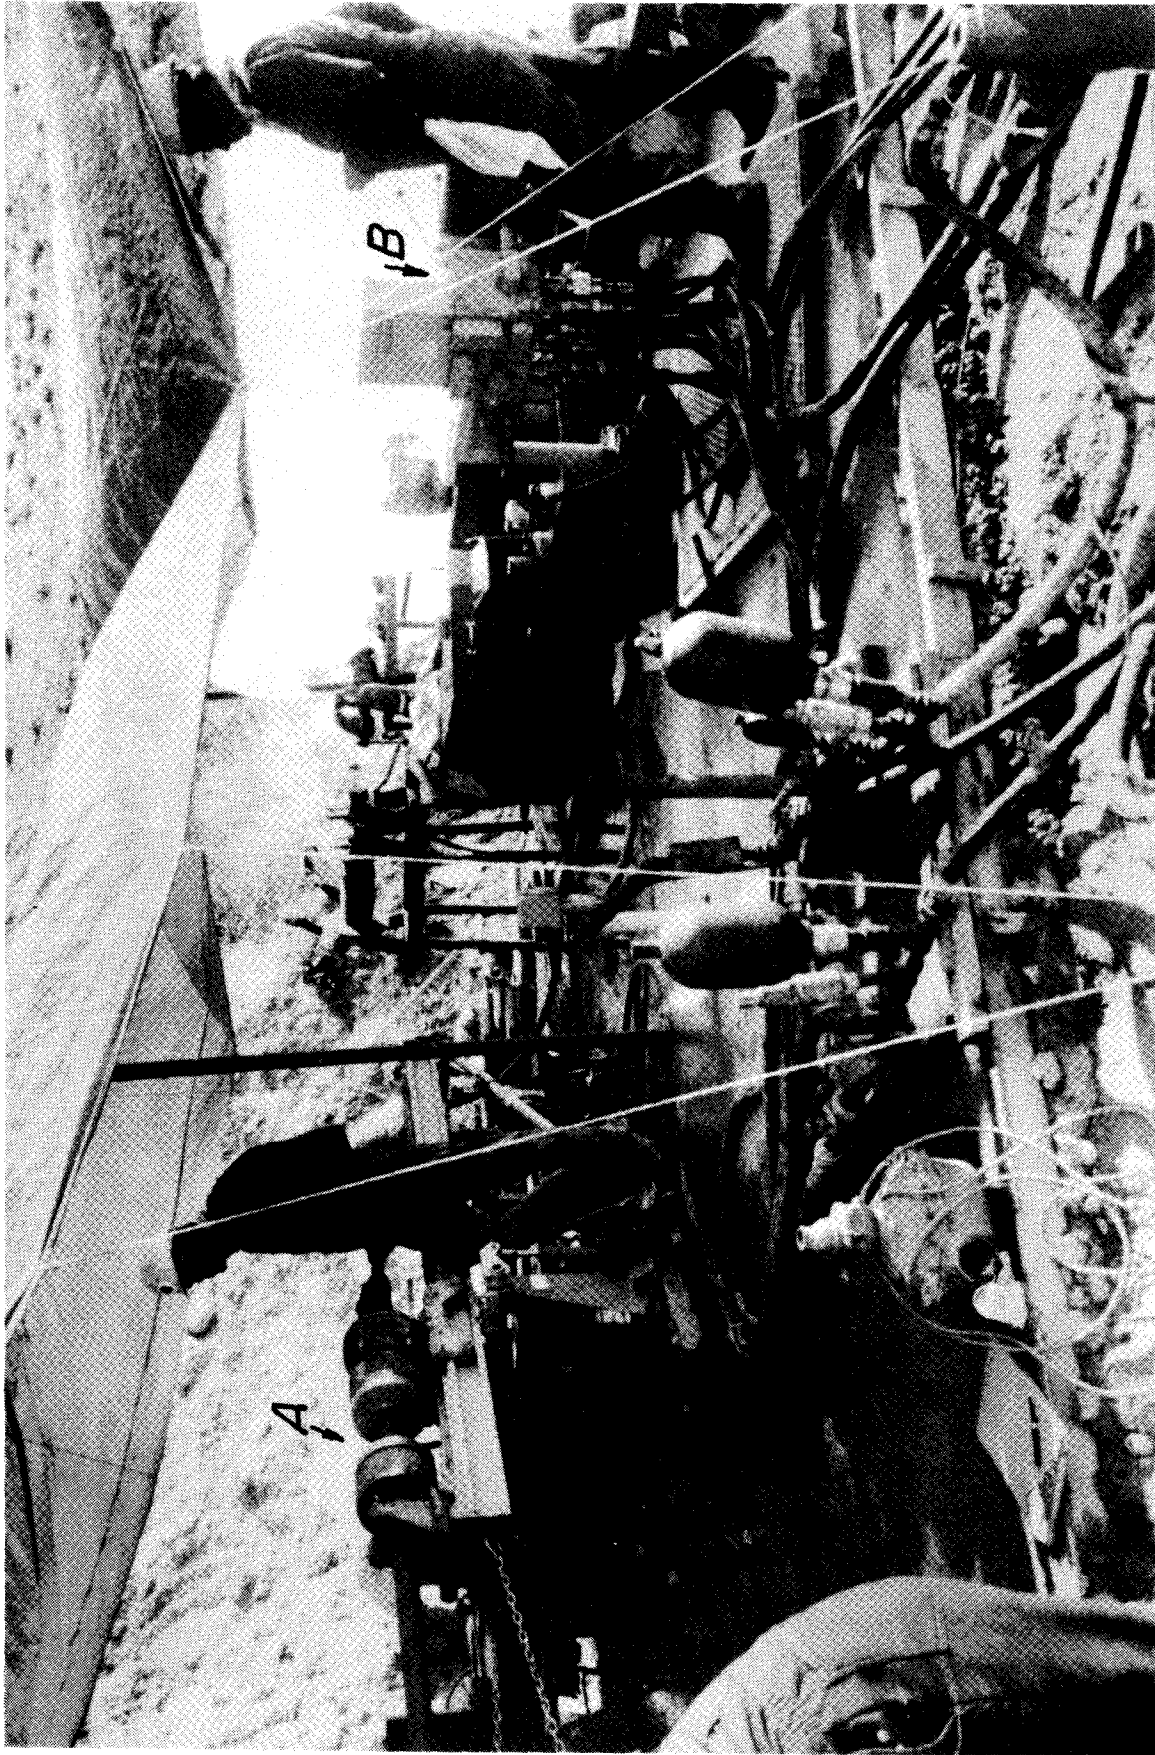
Diamant Boart hydraulic drill (A) drill or feed frame, and (B) control panel.
